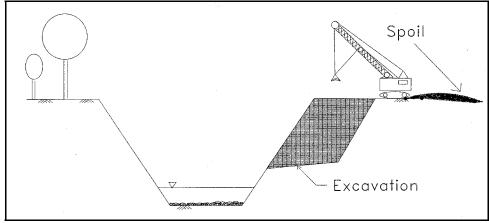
Typical cross section of stream showing overbank area subject to excavation (Source: CBBEL Files)
